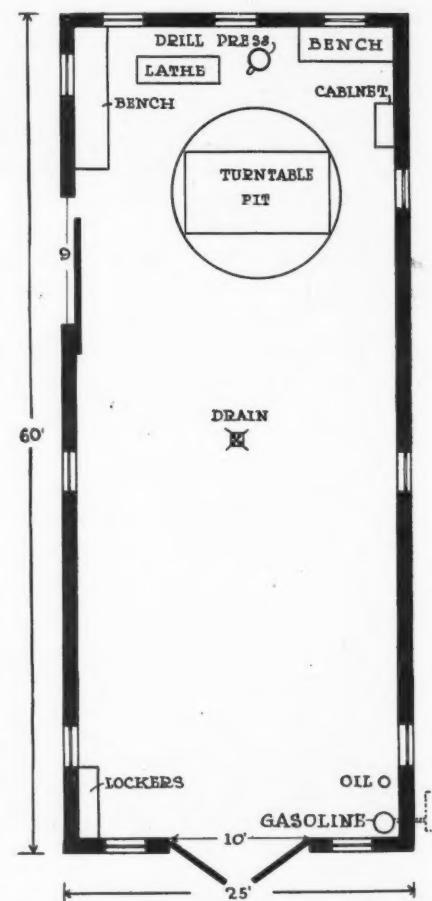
FLOOR PLAN OF A GARAGE FOR HOUSING SEVEN CARS
